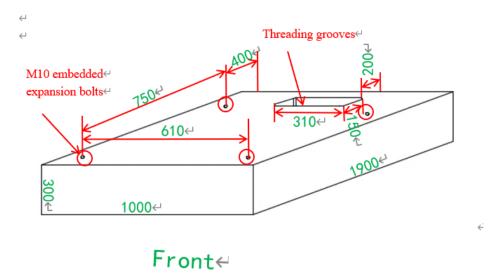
Cabinet equipment cement foundation form 1 (unit: mm)
